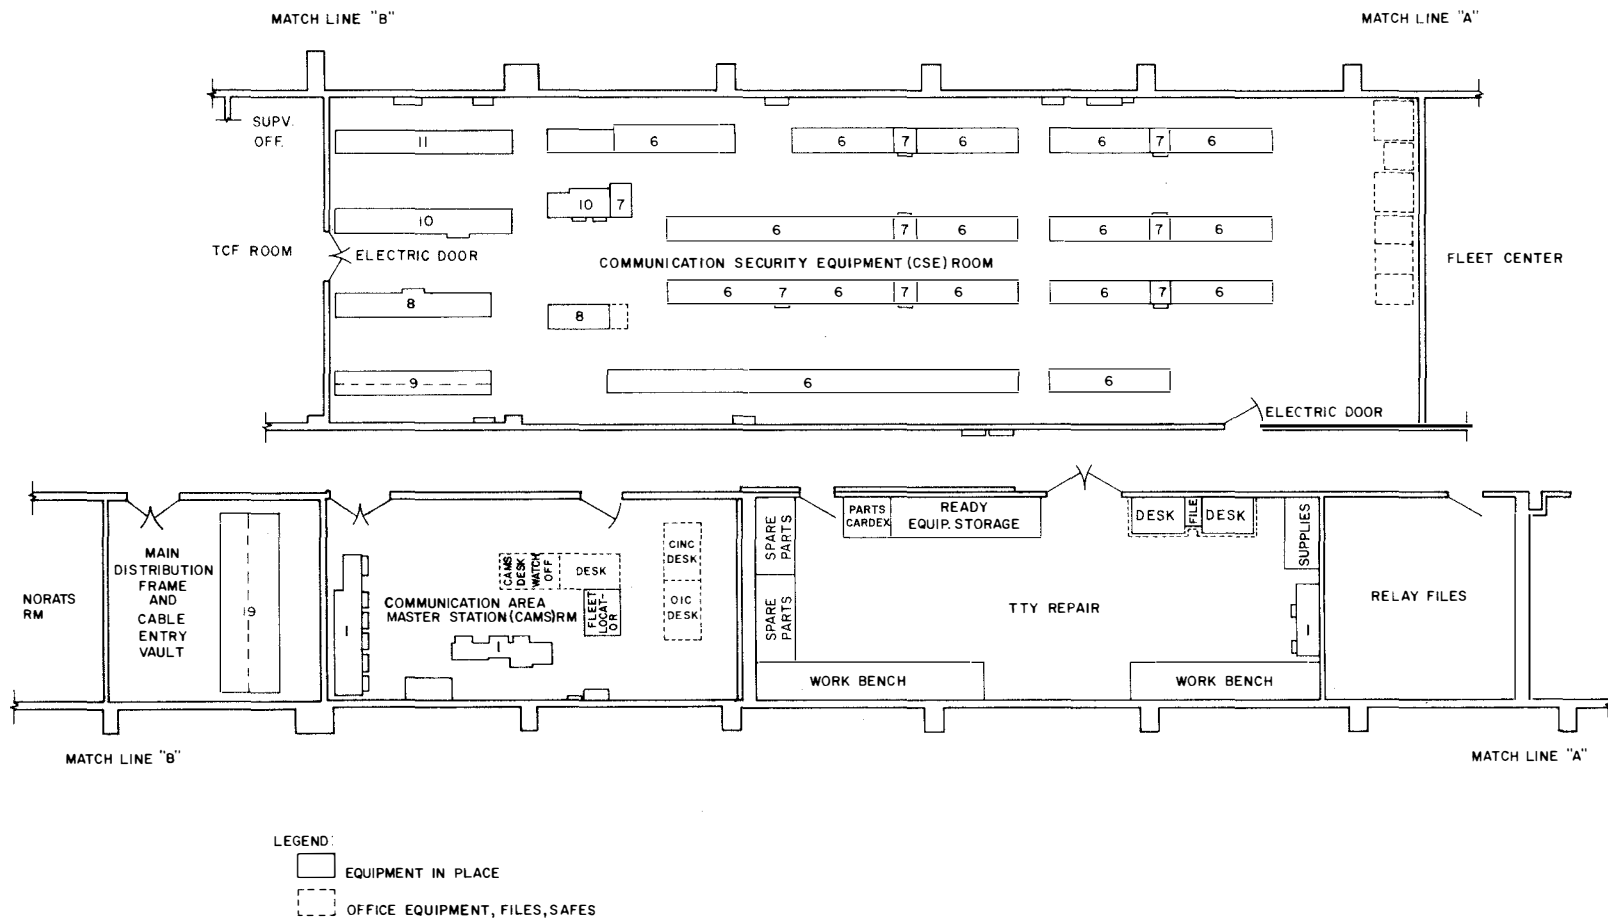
Typical Communications Center Layout (Sheet 2 of 3)
